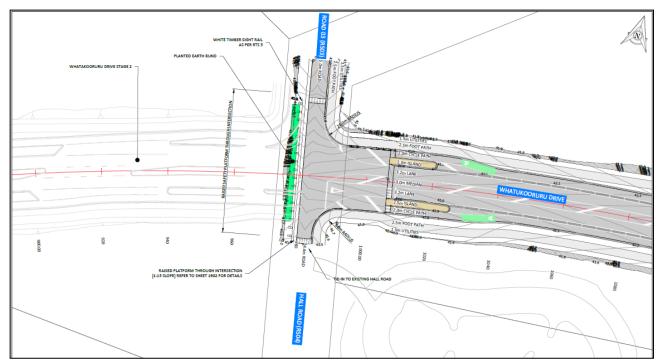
A temporary tie-in to existing Hall Road from Whatukooruru Drive
